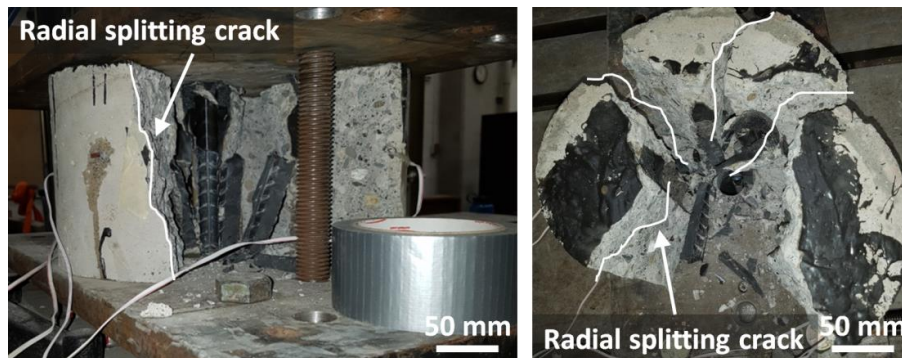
Specimen *i* radial splitting of concrete cylinder and grout
